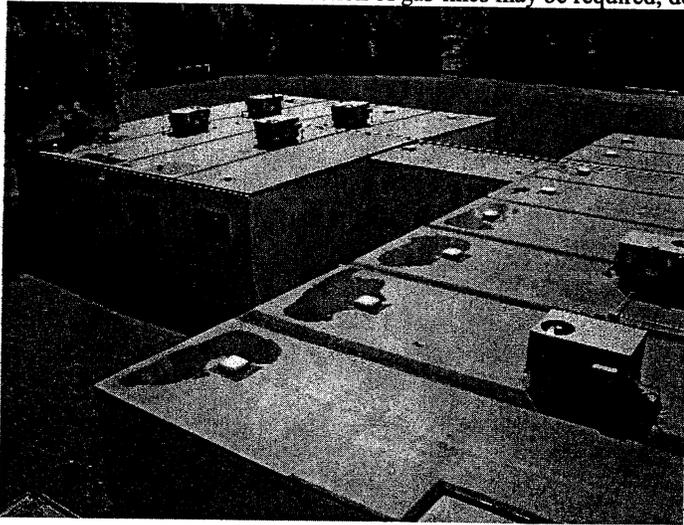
Drainage issues, and the type/kind of ventilation units used on these modular buildings, will require additional thought and (possible) improvements.
